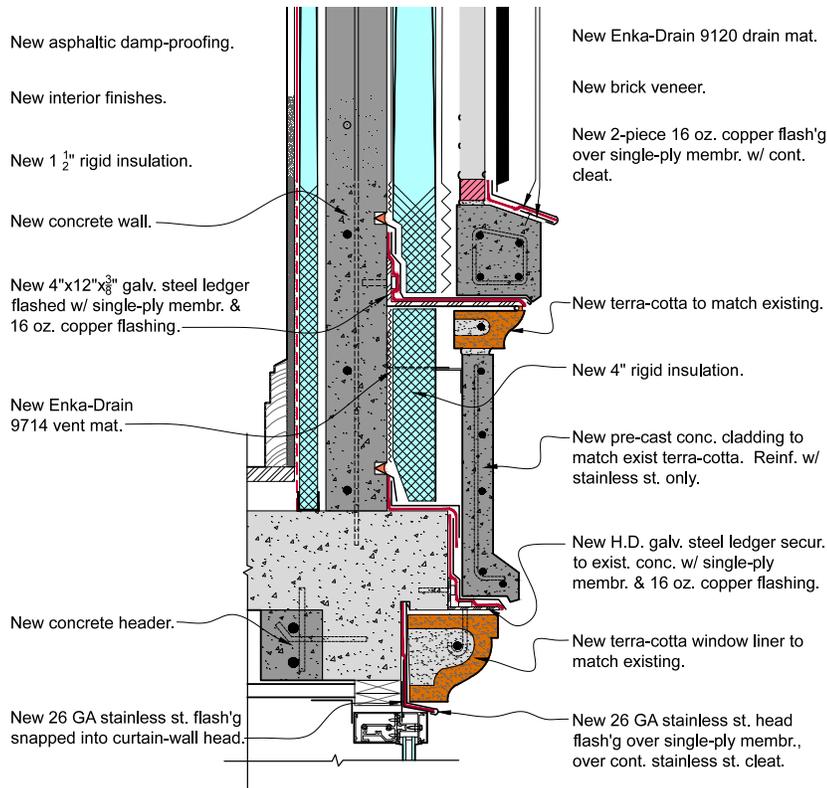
(13): Option 2 New Masonry Veneer Appr. Above Level 4 Windows
